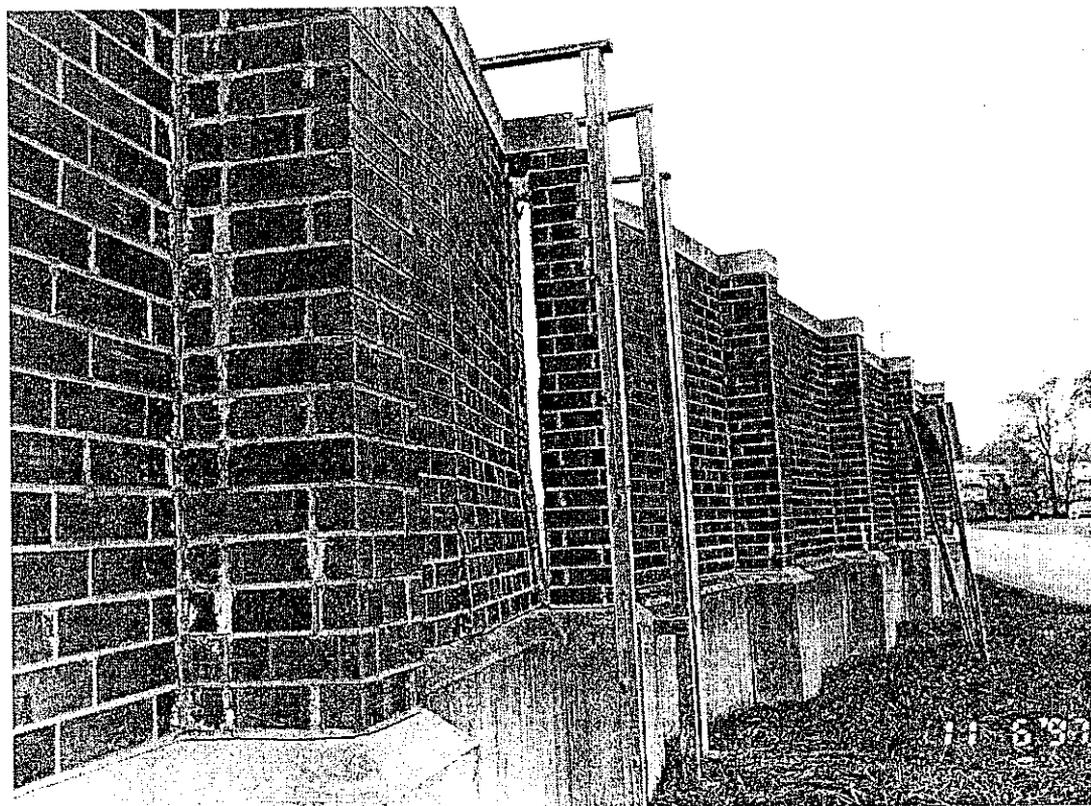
Failure of brick barrier, I-696, Detroit, MI.
